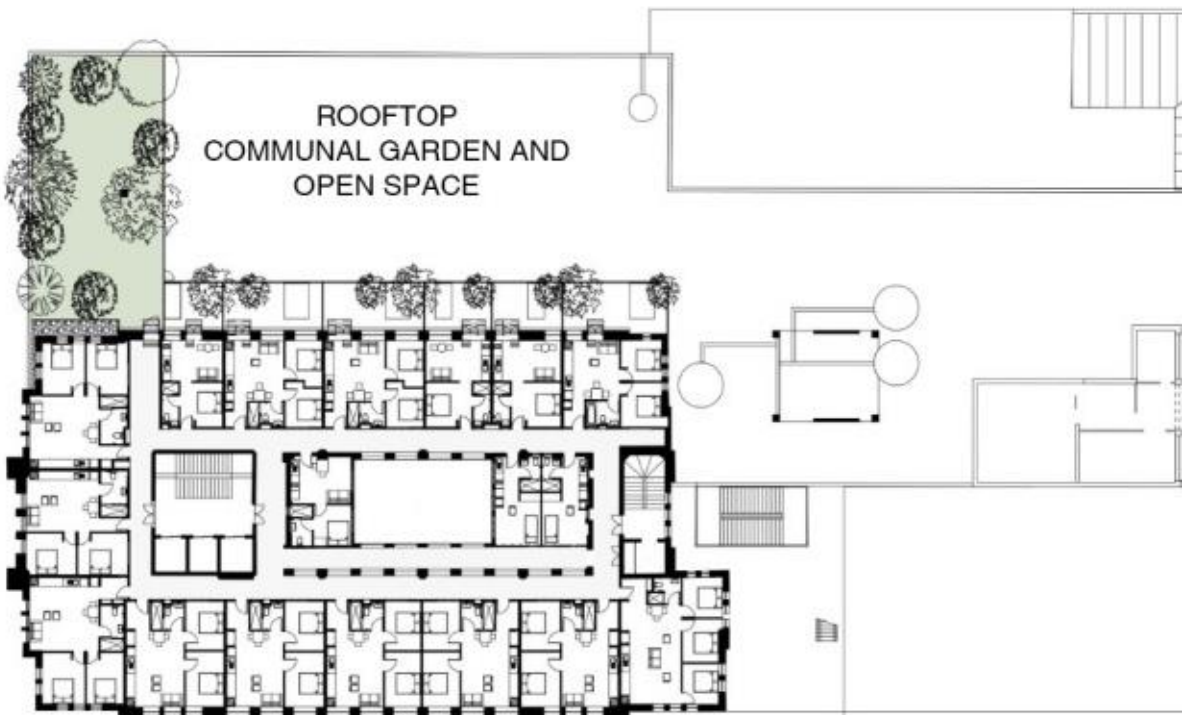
04-06 Typical Floor Plans. Image shows communal garden and accessible rooftop space (Design Workshop SA, 2018. Edited by author).
